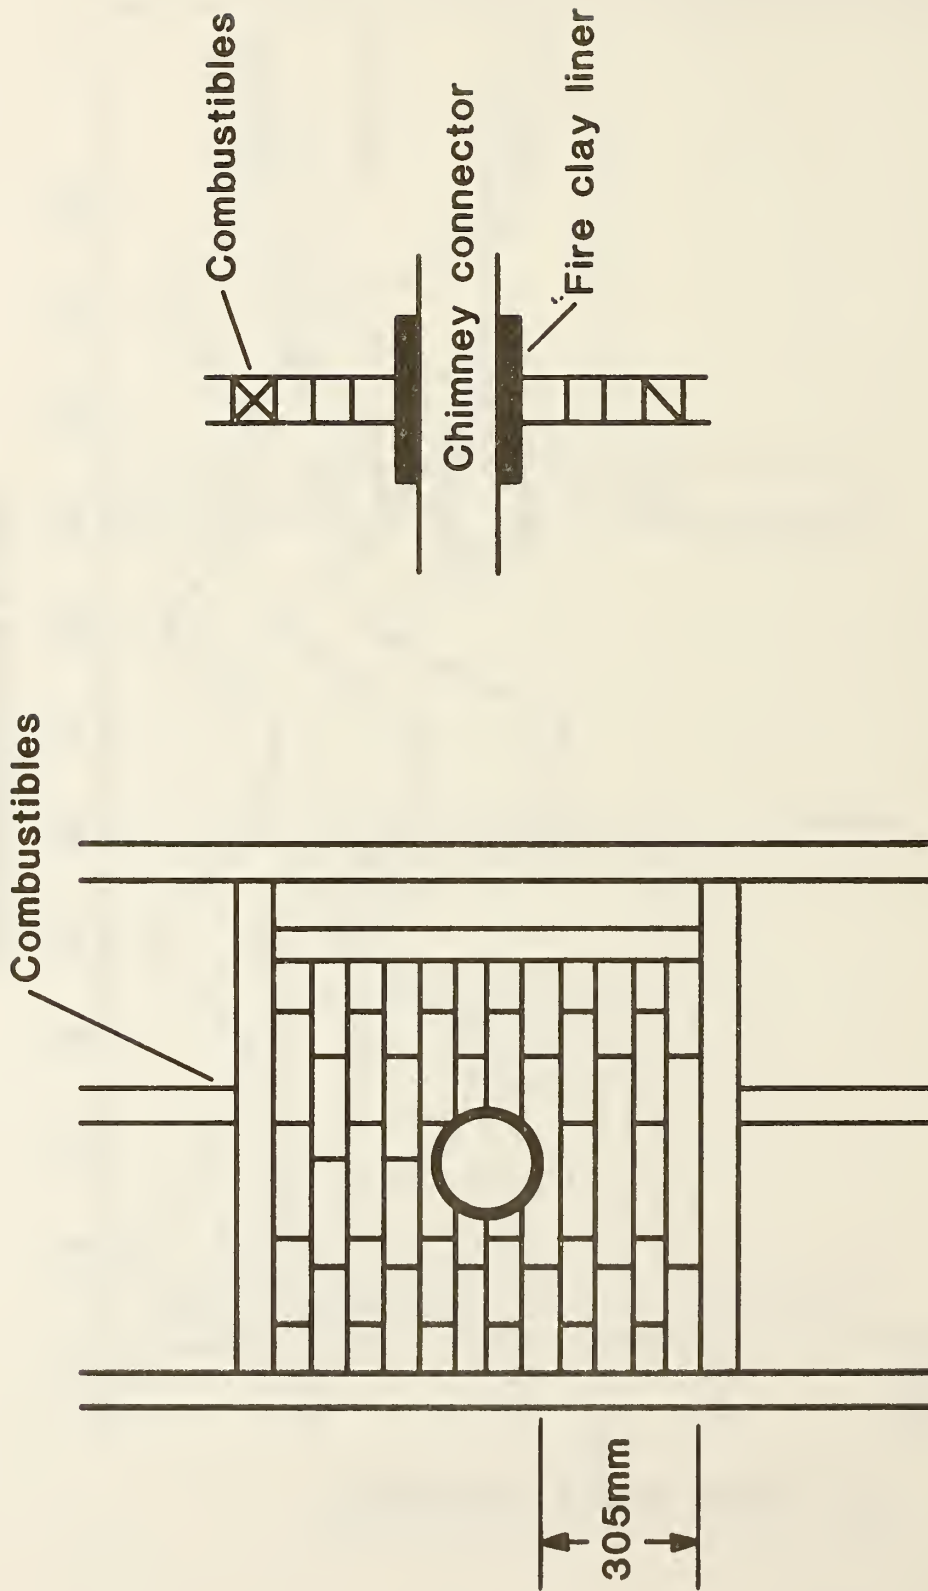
Brick Masonry Patch - 305 mm (12 in) Brick Separation to Combustibles
